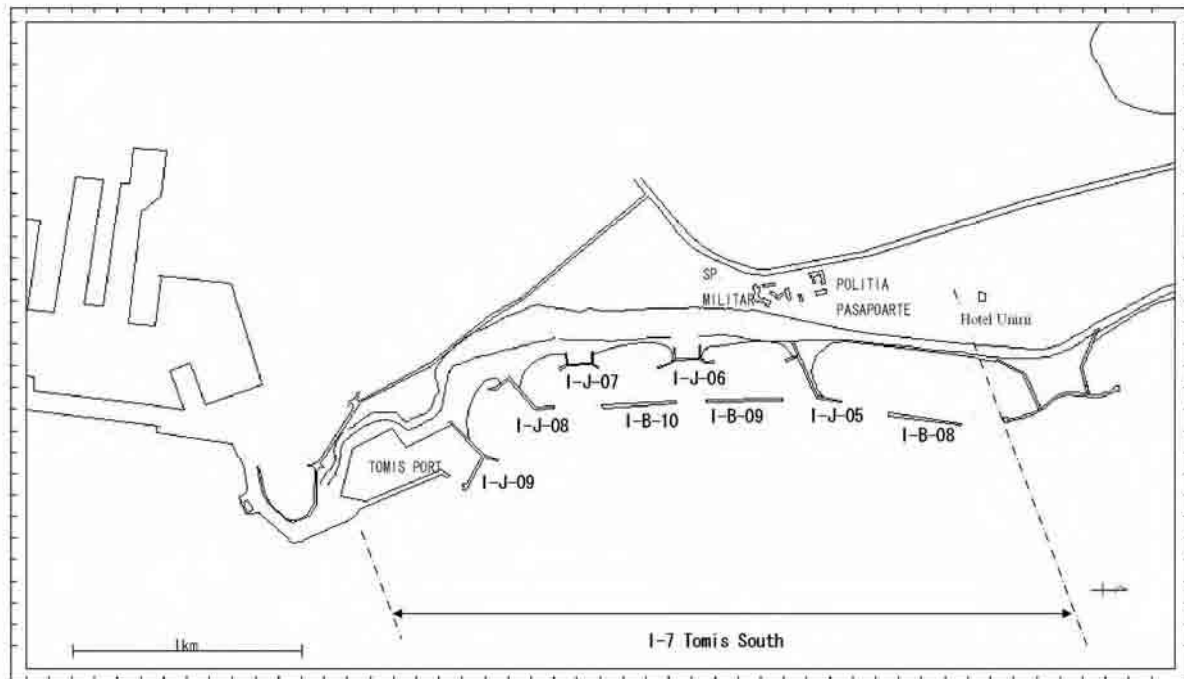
Location map of existing shore protection facilities (3)
